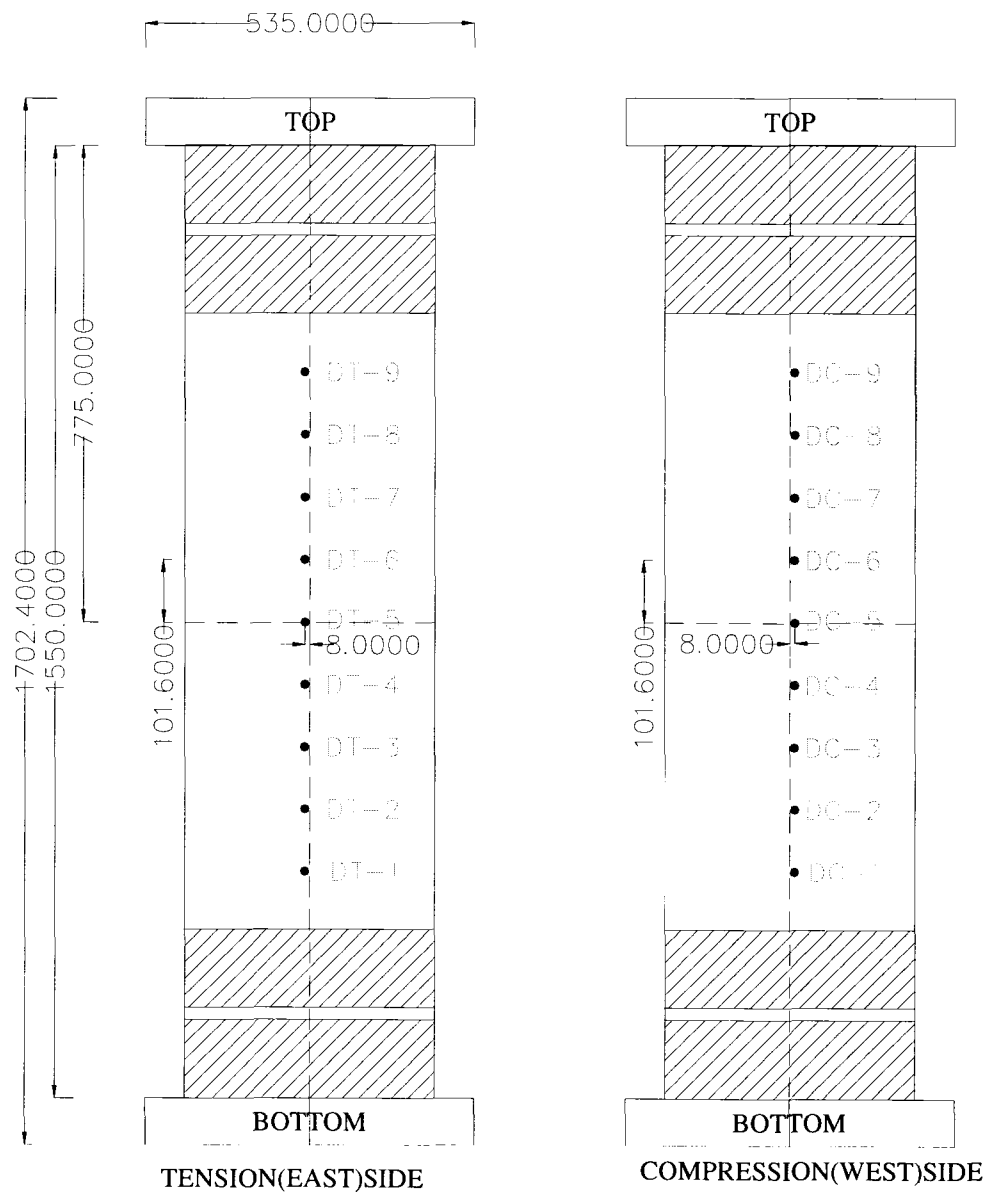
Demec Layout for 16 inch Pipes - Initial
